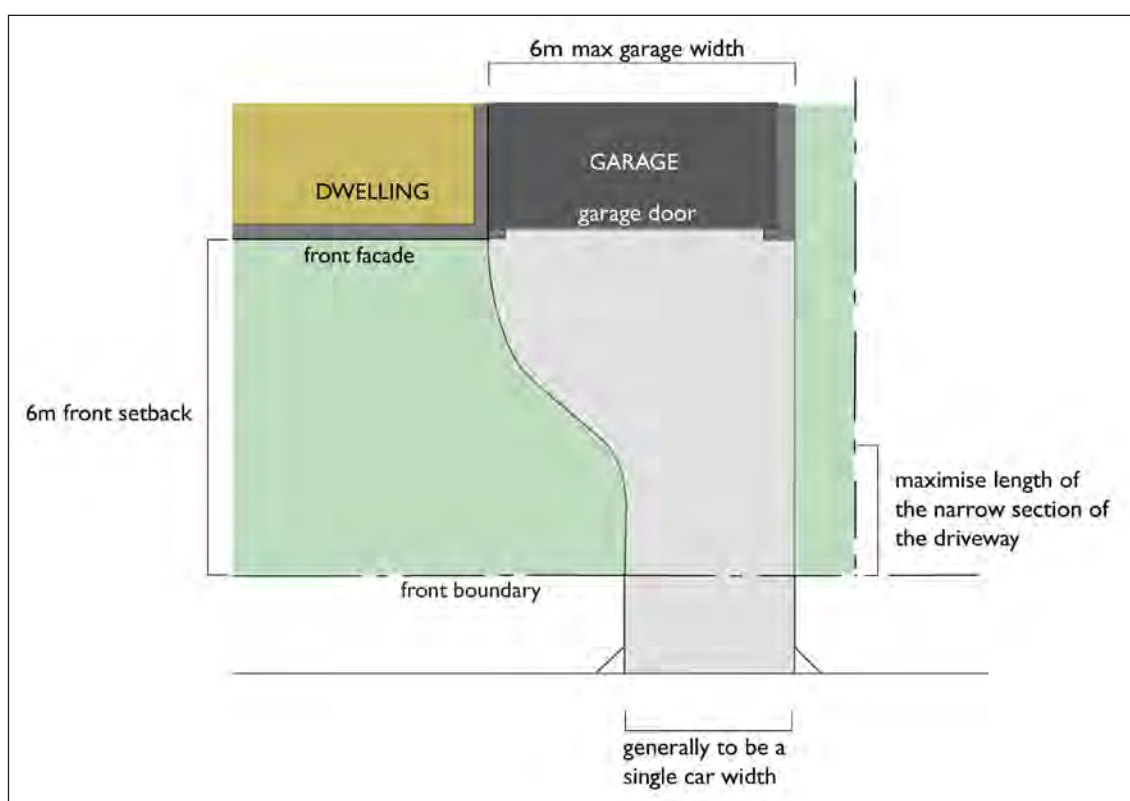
Driveway. The width of the driveway is to be minimised. The garage door is to be setback no more than 300 mm from the front of the structure above
